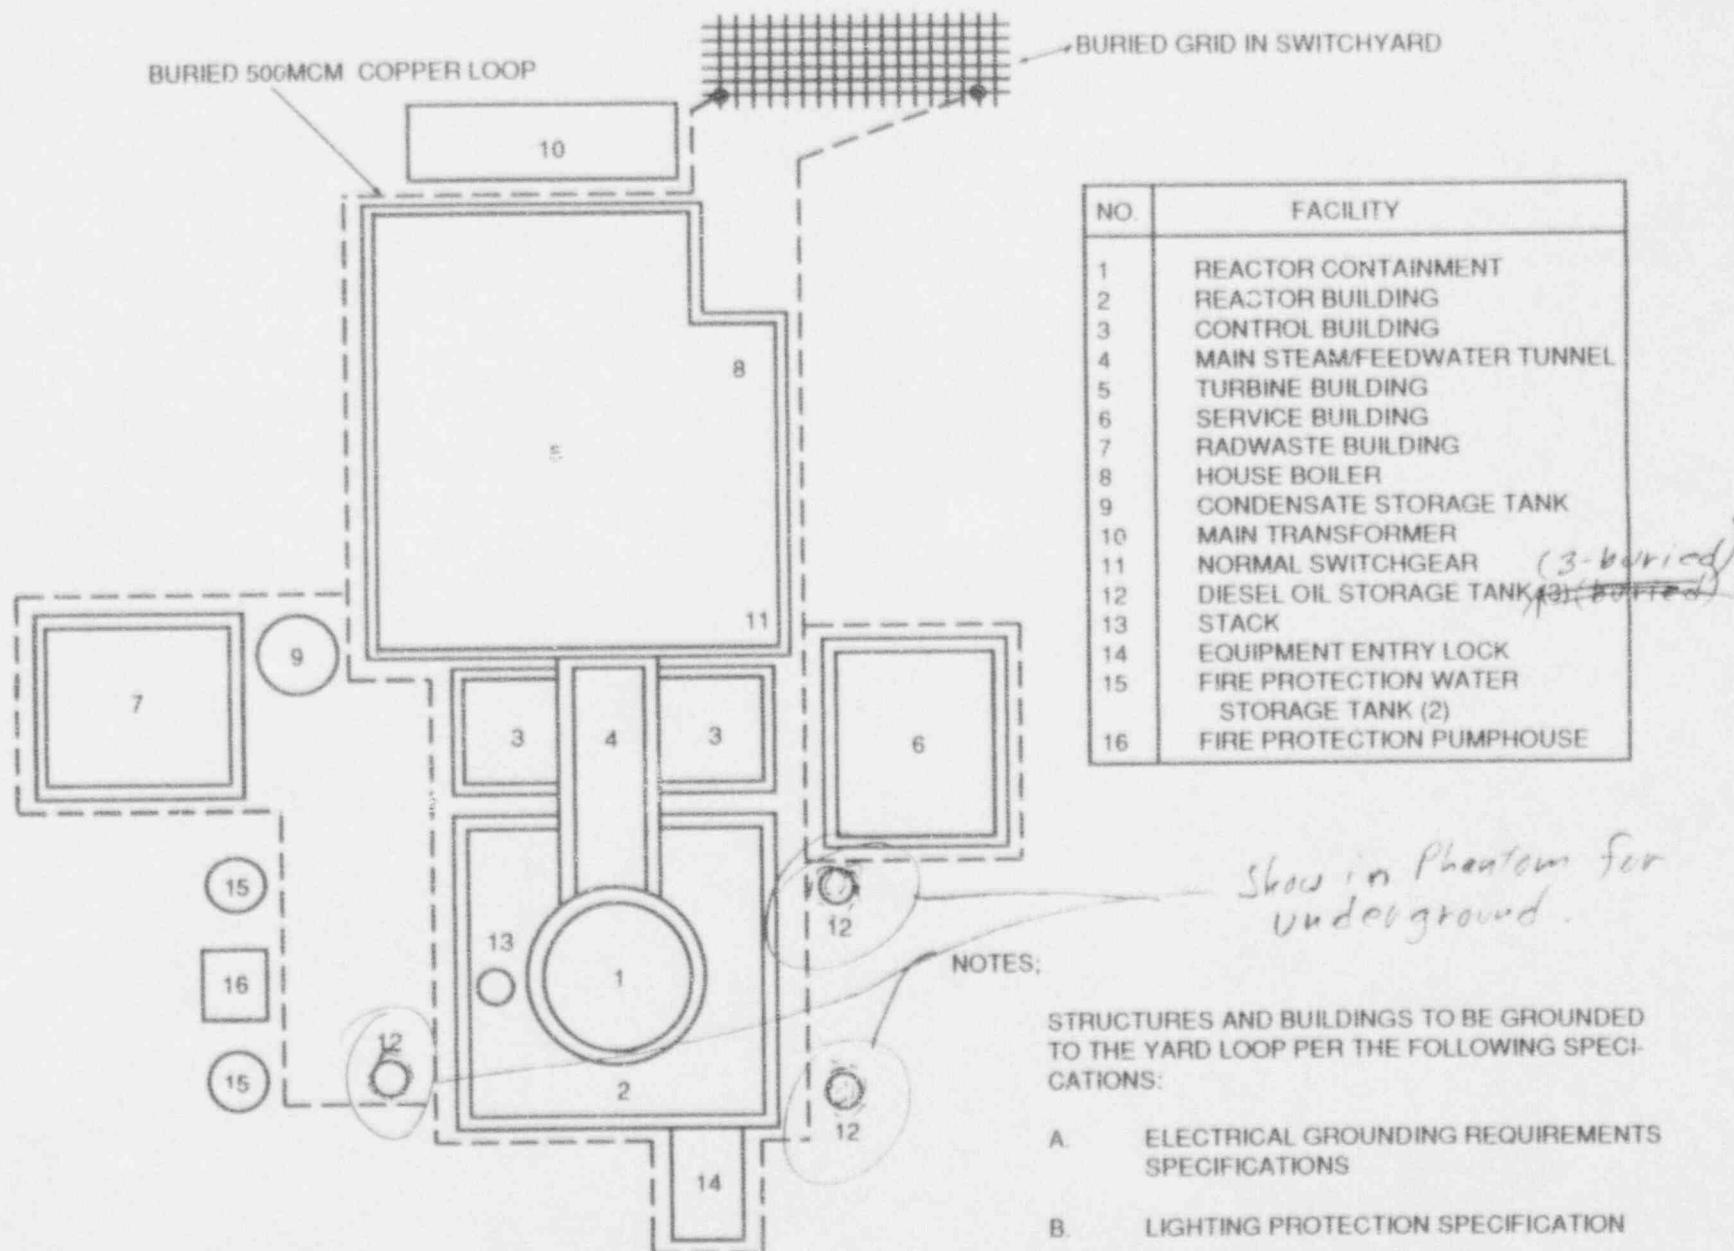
A.1-1 SITE PLAN (GROUNDING)
